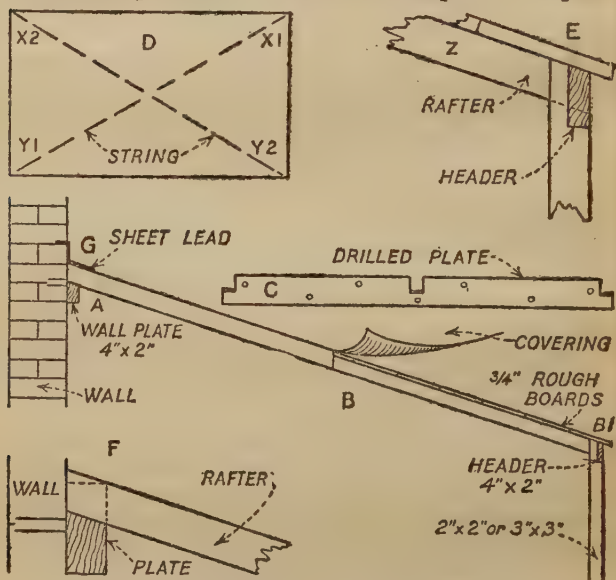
DETAILS OF ROOF OVER LEAN-TO
